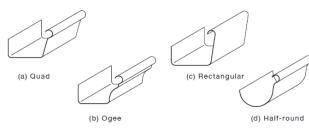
(A) TYPICAL EXTERNAL EAVES GUTTERS
